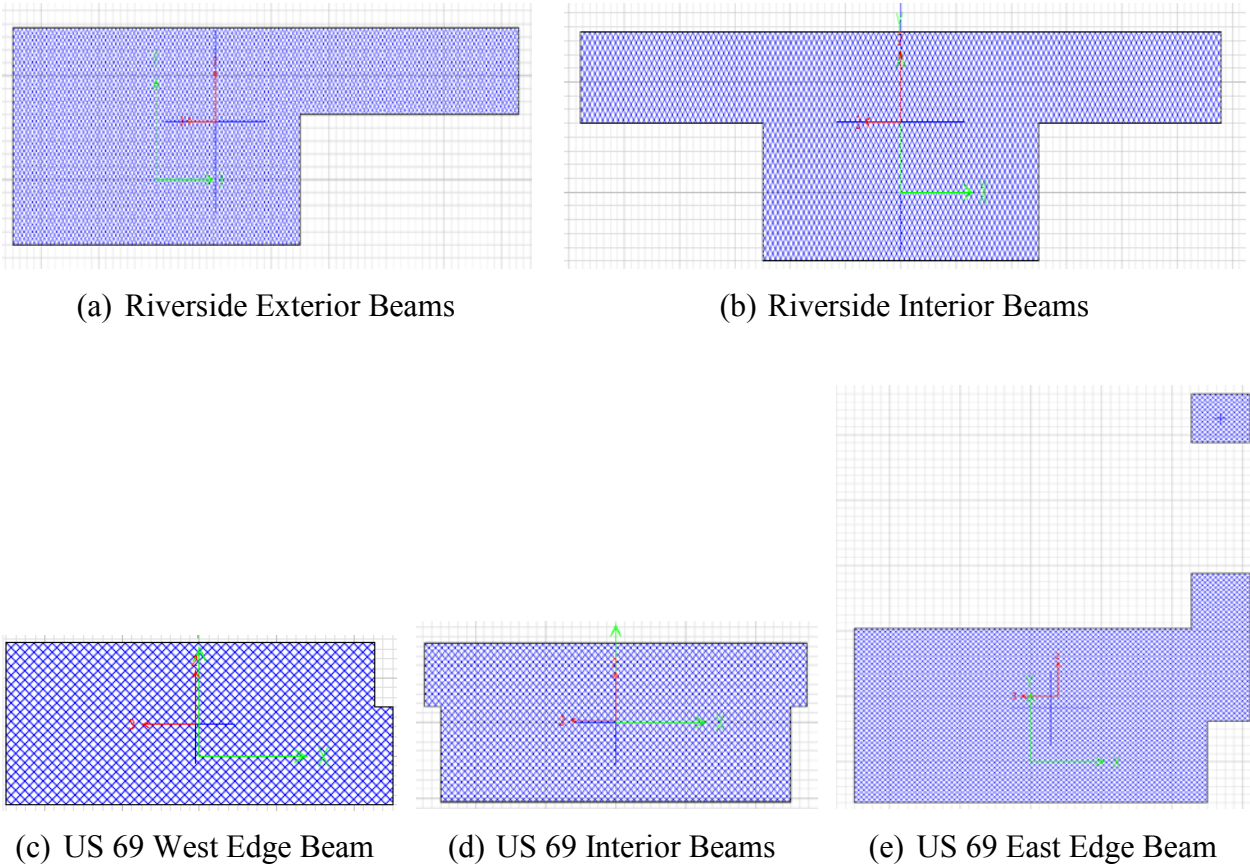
Longitudinal Grillage Member Section in Two Tested Bridge Models.
